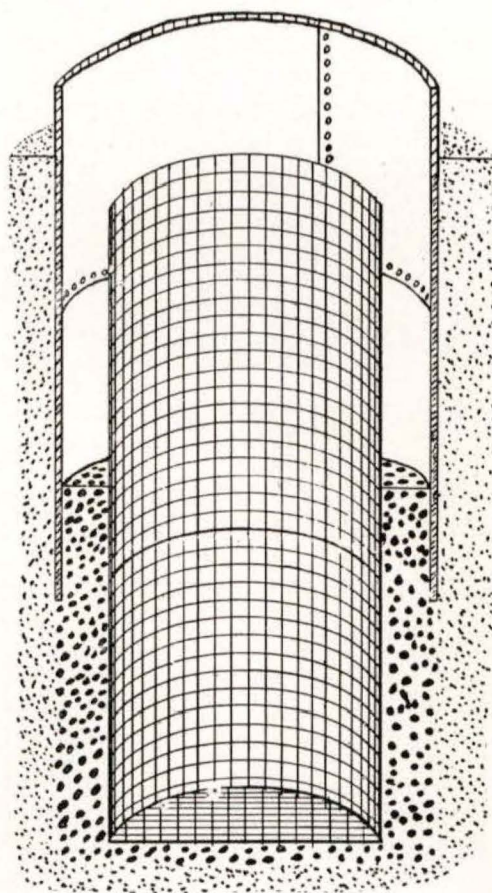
Section showing perforated casing with a part of the gravel in place and outer "blind" casing being removed
